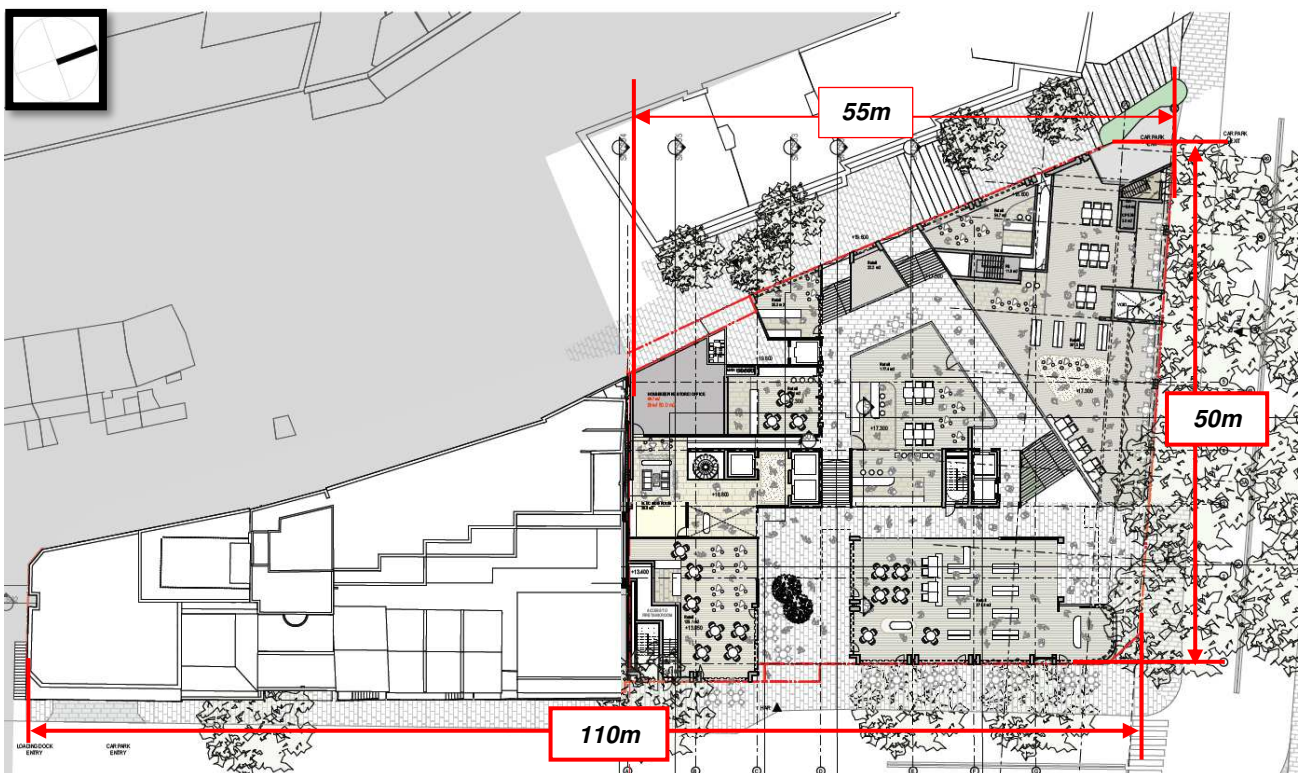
Ground floor plans (Lower Ground and Upper Ground combined) with the plan-form dimensions overlaid.
